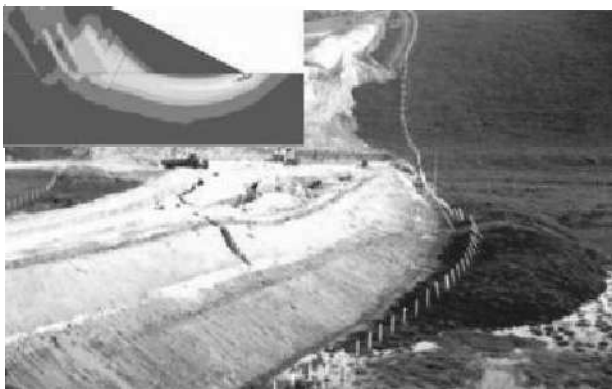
Slope stability failure of an embankment directly founded on soft soil and numerical illustrated shear failure zone (foto: HUESKER)
